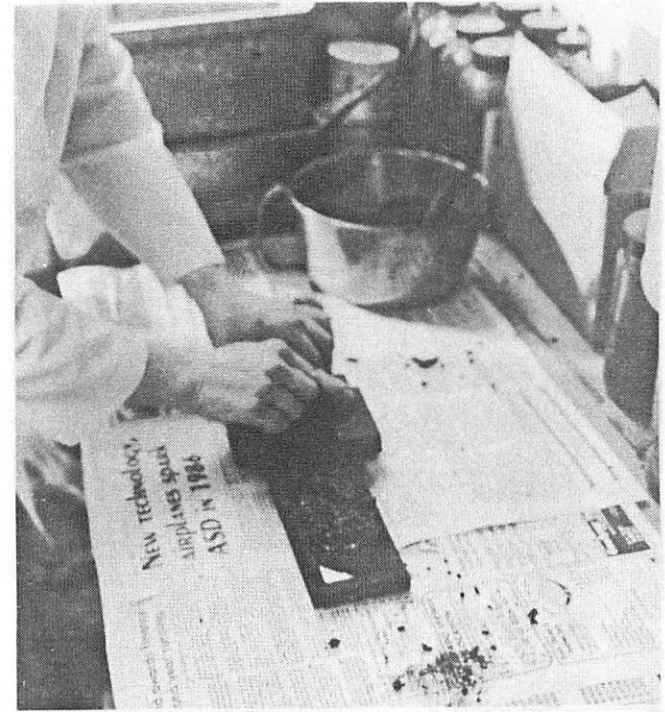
CASTING AND FINISHING THE SPECIMEN.
